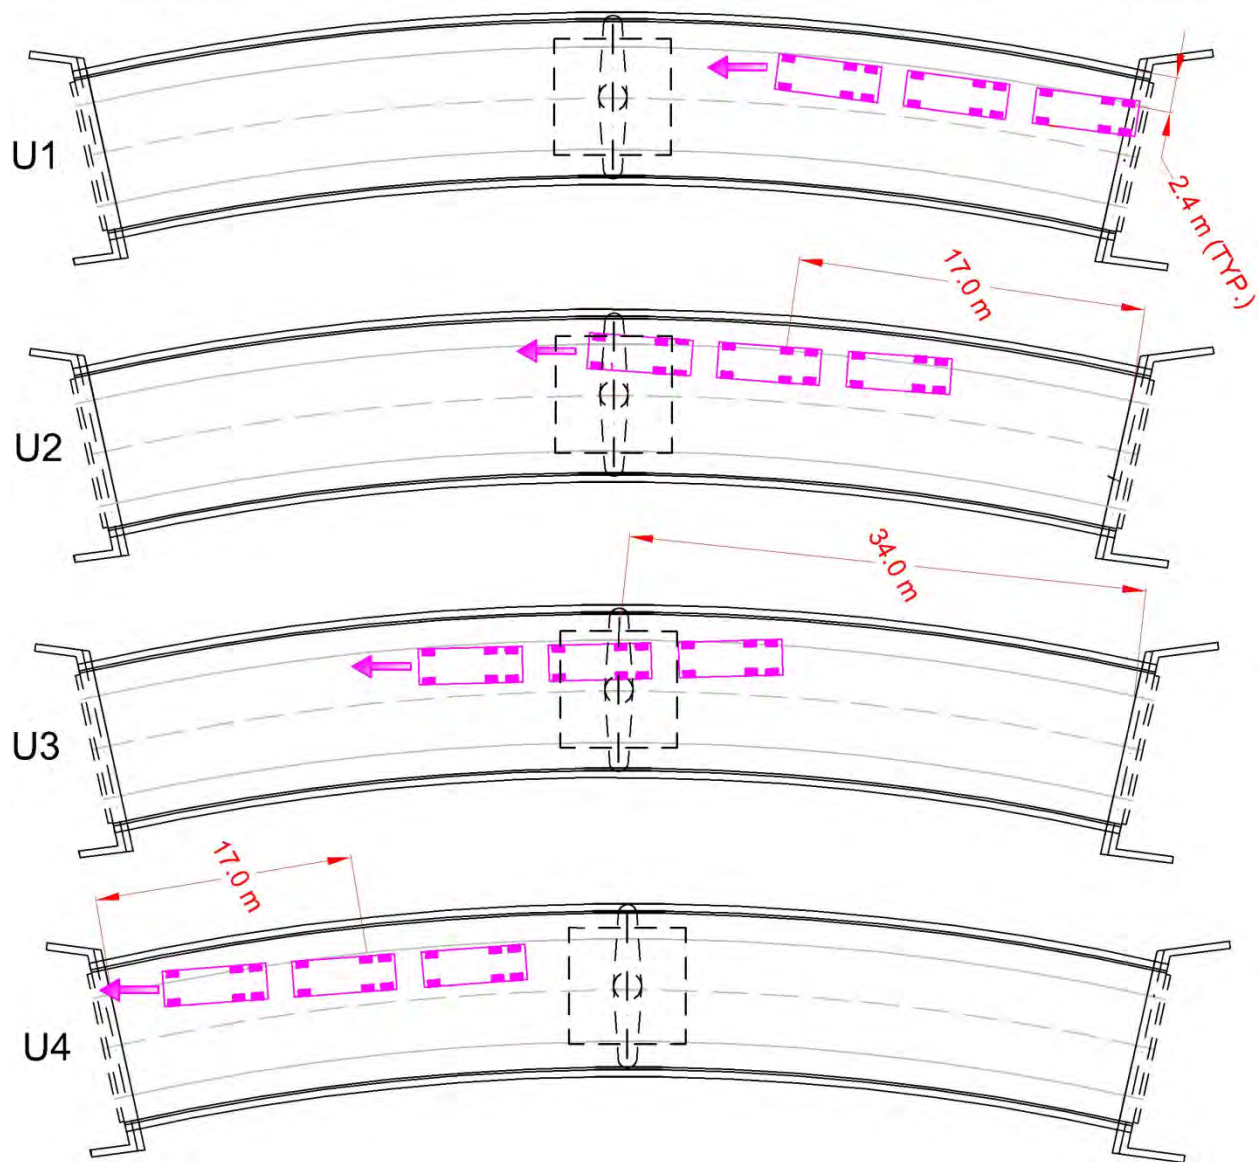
Stockbridge Load Testing Truck Locations (Upstream Lane – Forward)
